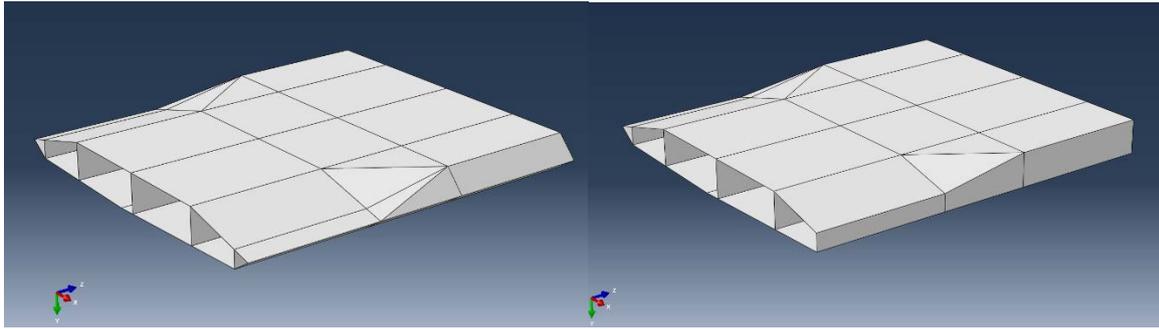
Transition from trapezoidal bridge girder section to rectangular section viewed from below, with and without airfoils included respectively
